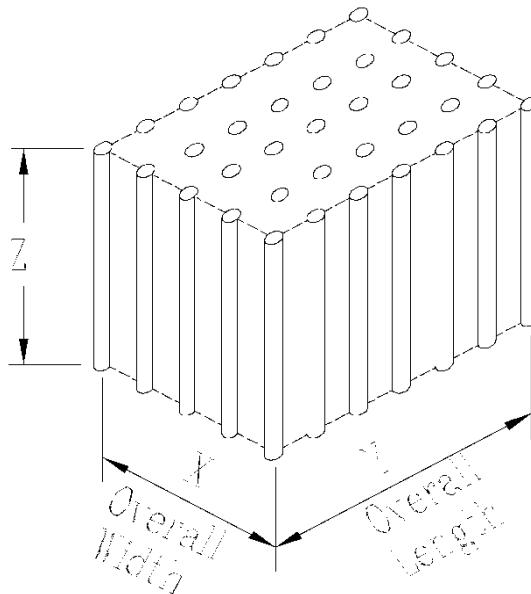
Pile Group Acting as a Block Foundation
